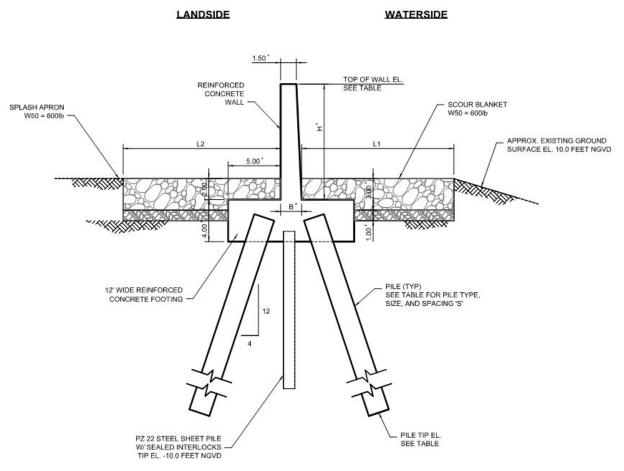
Floodwall Typical Section (Reach A-3) Buried Seawall
